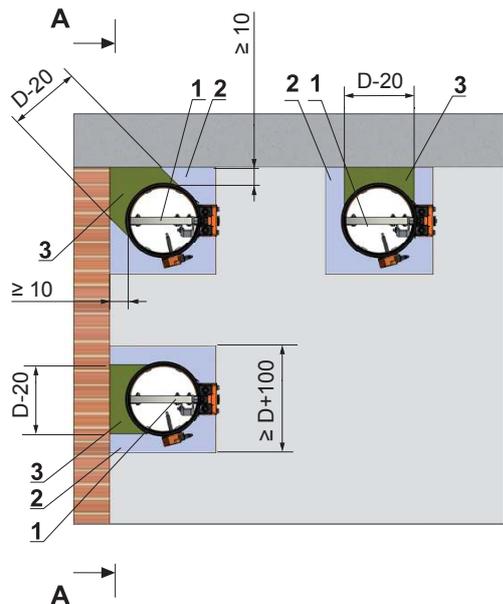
Gypsum wall construction - installation next to wall, ceiling - mortar or gypsum and mineral wool
